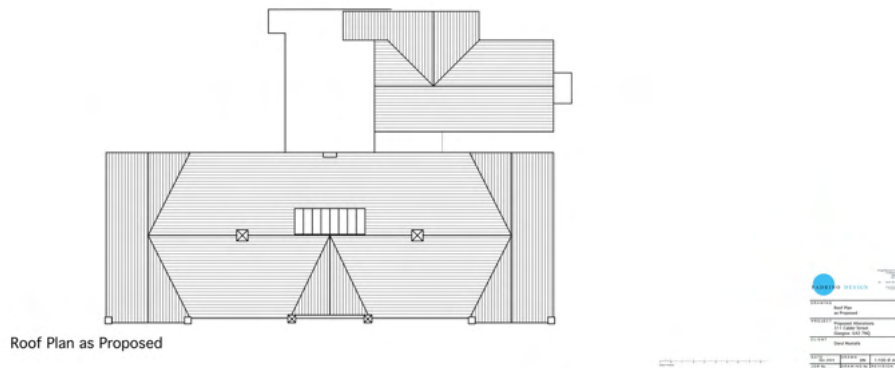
Roof Plan as Proposed. Assessment relevance: Proposed roof geometry for the rear extension and its relationship to the existing roof plan. Source: Padrino Design drawing pack, job no. 2499, 311 Calder Street, Glasgow G42 7NQ.
